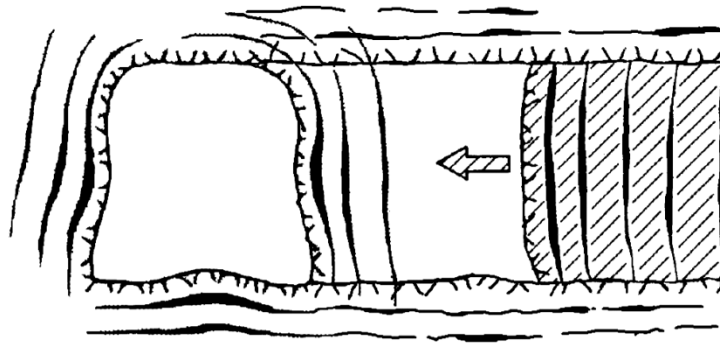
Slabbing of the face and sidewall of underground excavation (Muehlhaus, 1990).
